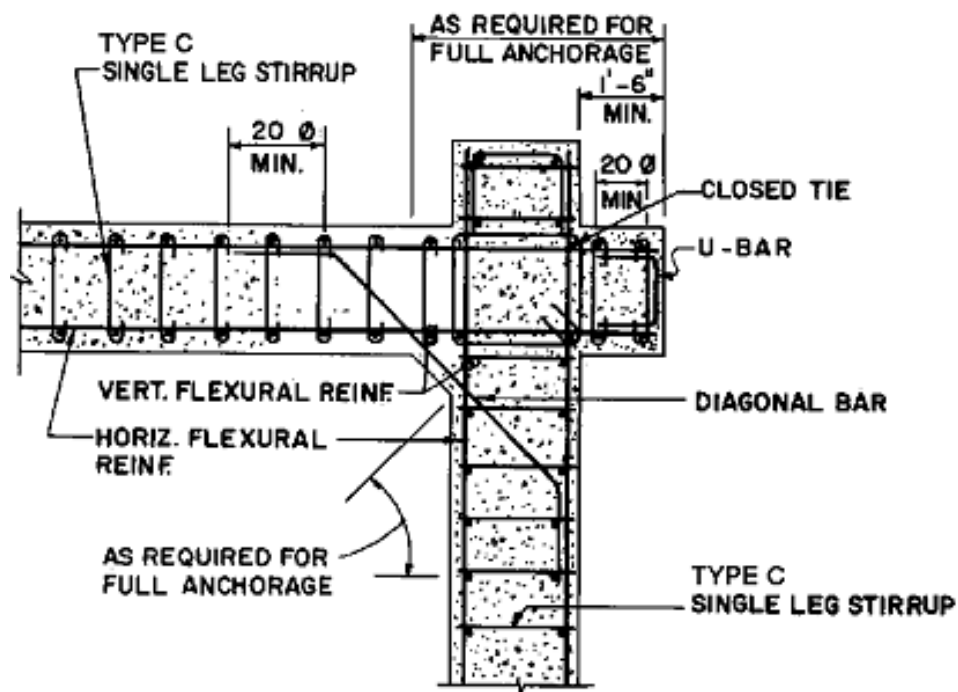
Reinforcement Detail of Wall with Type C Single Leg Stirrups
